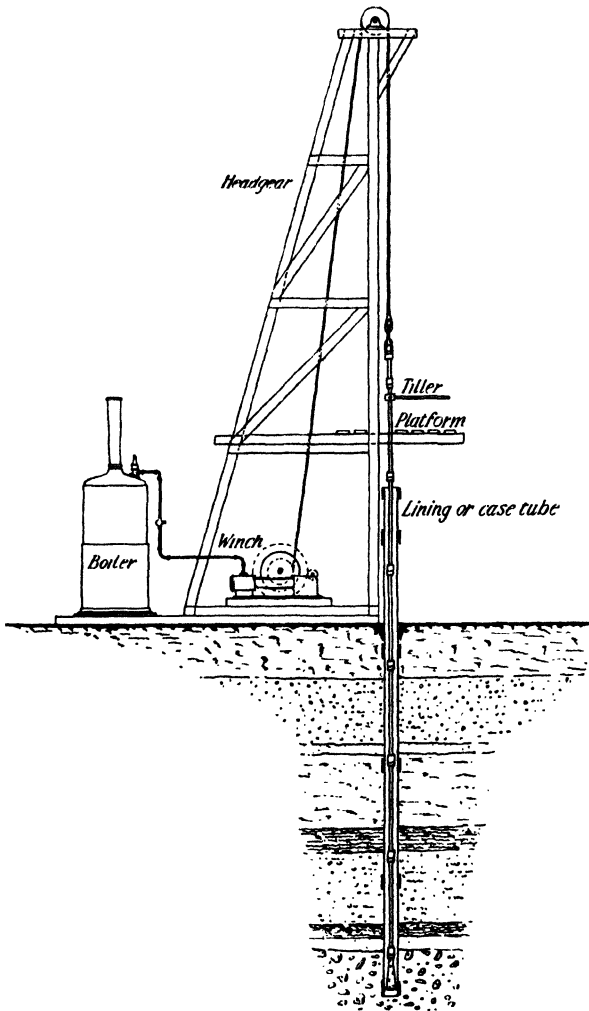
Percussive and Wash Boring Power Plant, with Timber Frame Headgear.
